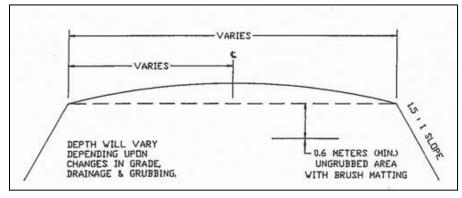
CROSS SECTION OF ROADWAY EMBANKMENT
